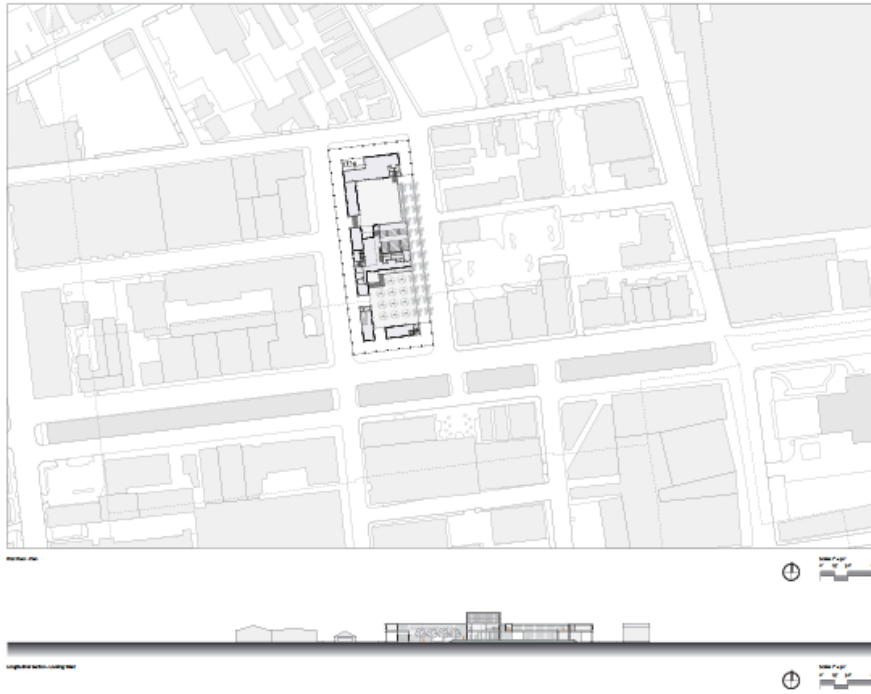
Ground Floor Plan and North/South Section of Sigma
